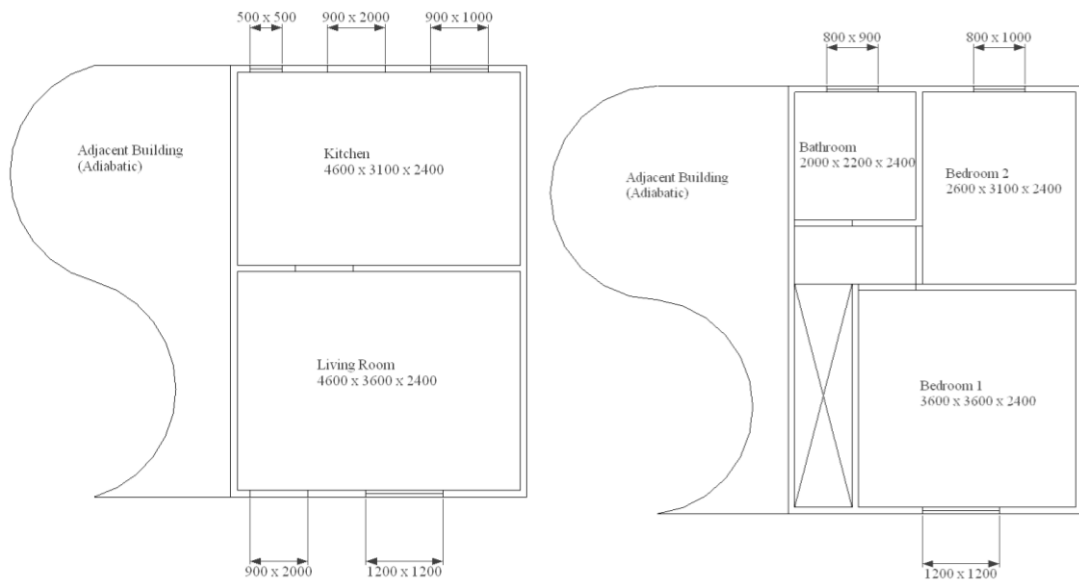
Ground floor and first floor plans for the manual control building respectively.
